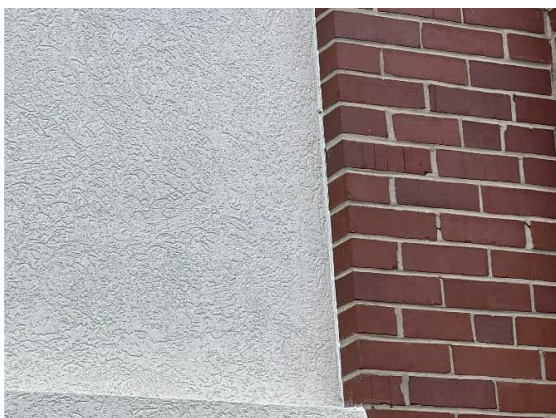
Non-asbestos white window caulk (HA #18) and non-asbestos stucco window panels (HA #19)
